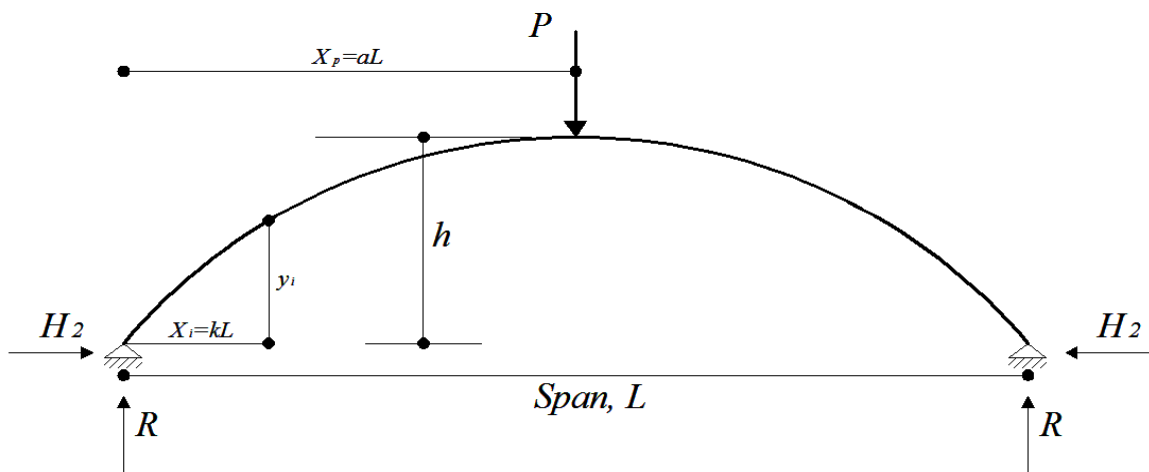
Geometry, Support and Load Conditions of Parabolic Geometry of Arch
